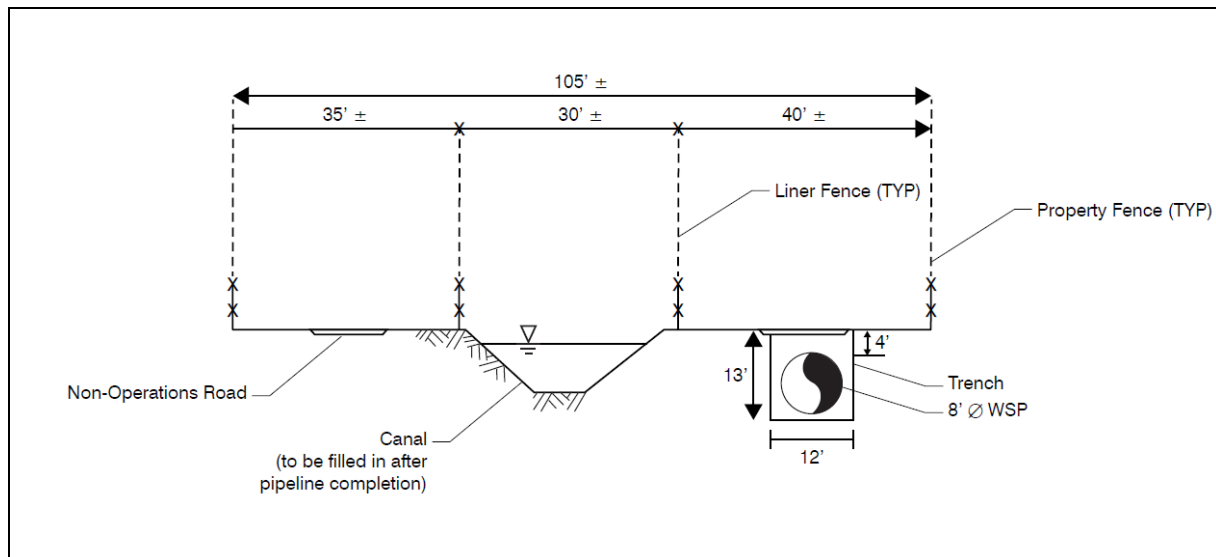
Pipeline Installed in an Open Trench under the Operations Road
